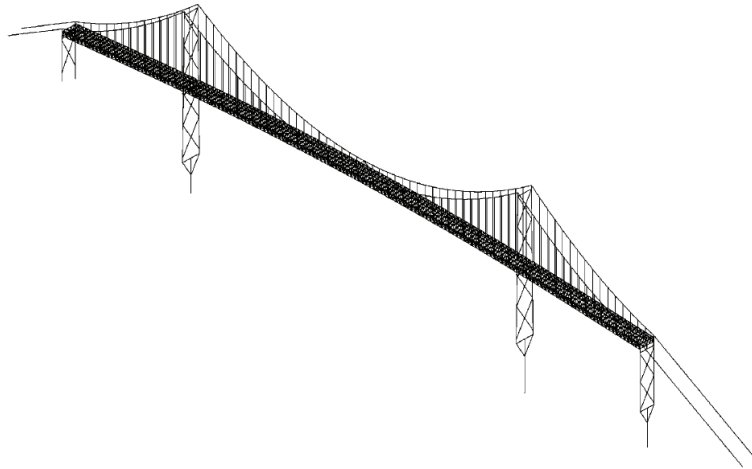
Global bridge model (courtesy of Buckland and Taylor)
